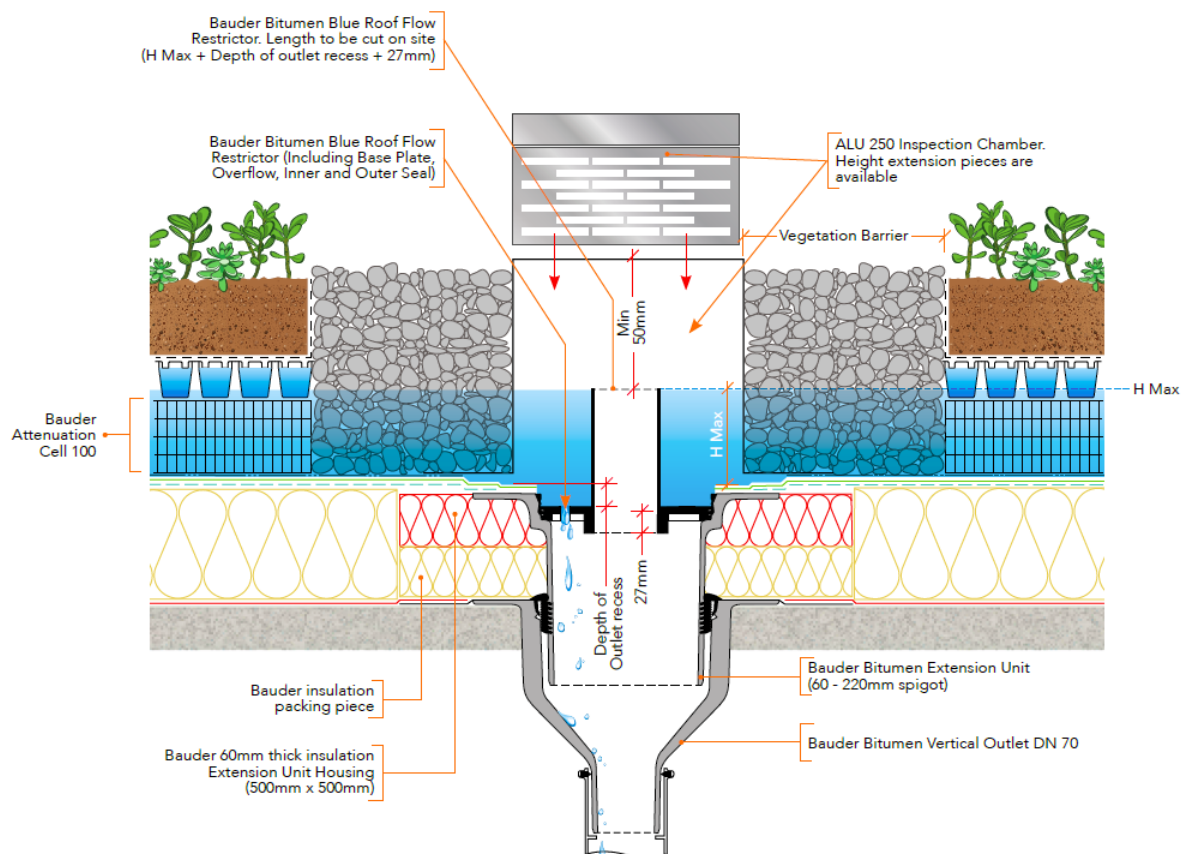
Typical flow controlled outlet detail (Courtesy of Bauder)
